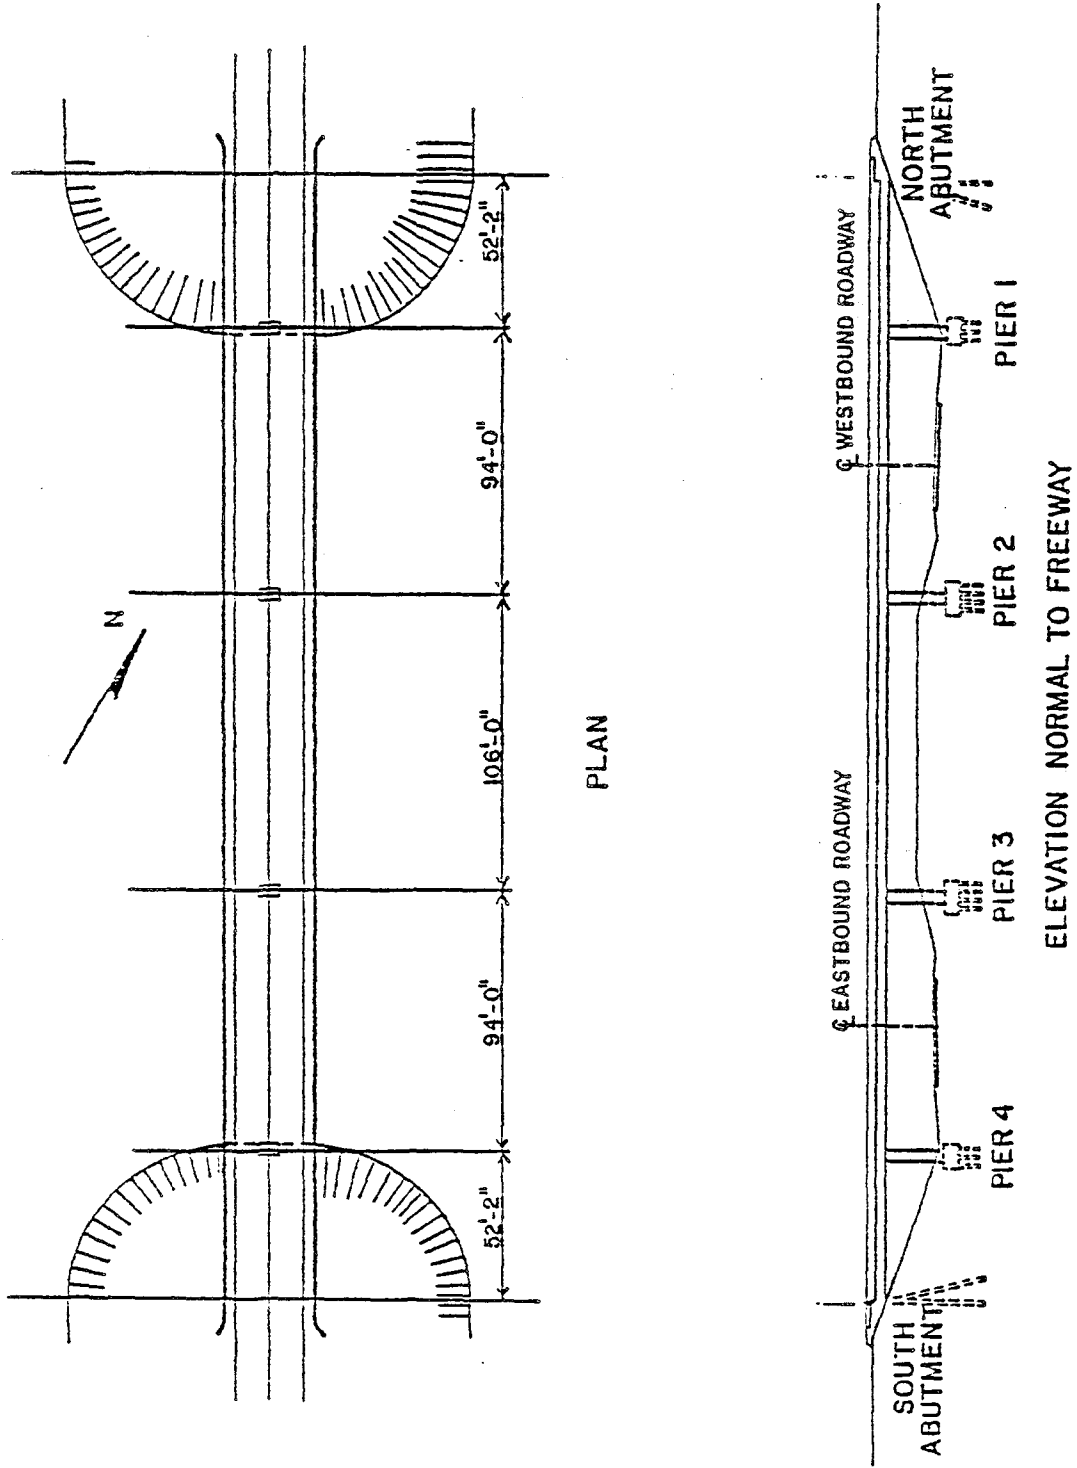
Planview and Elevation of Rose Creek Bridge
